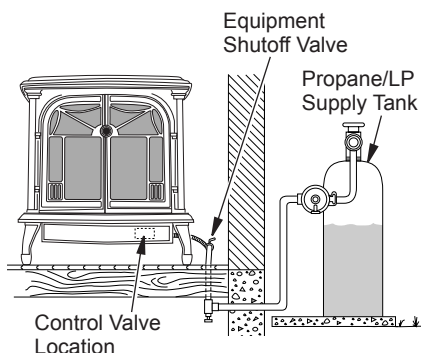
Checking Gas Joints on Propane/LP Gas Unit
